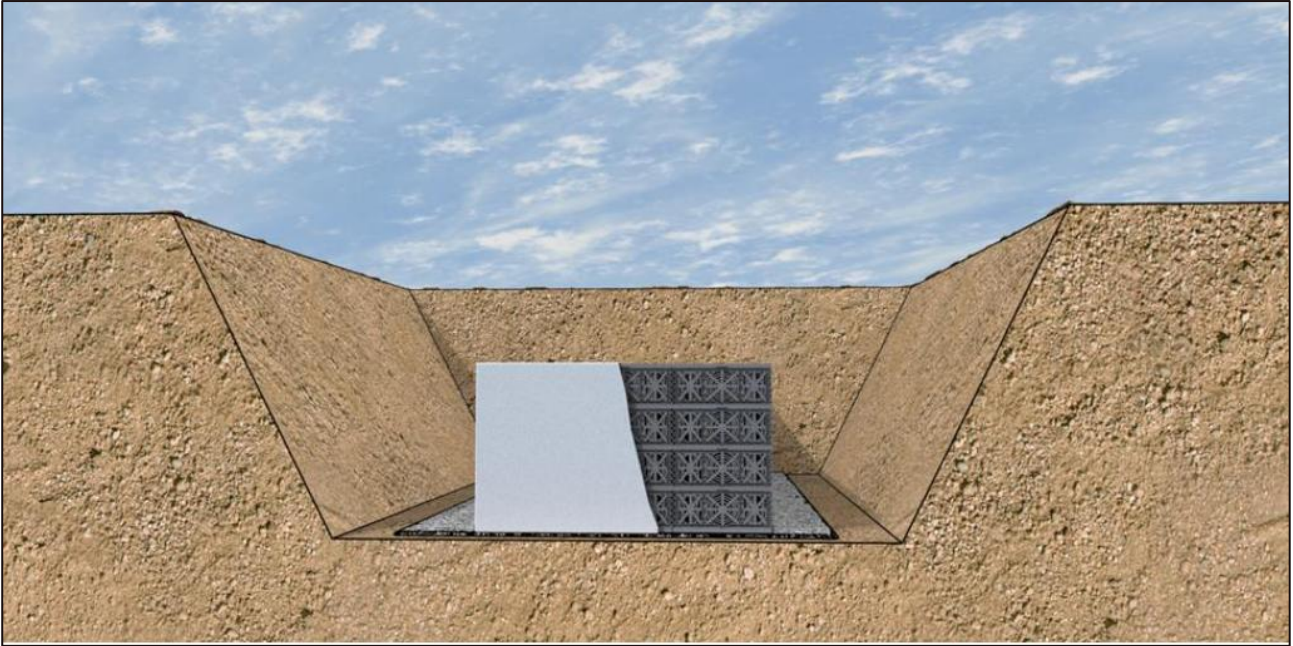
Stormwater drainage cells that form part of the early/enabling works
